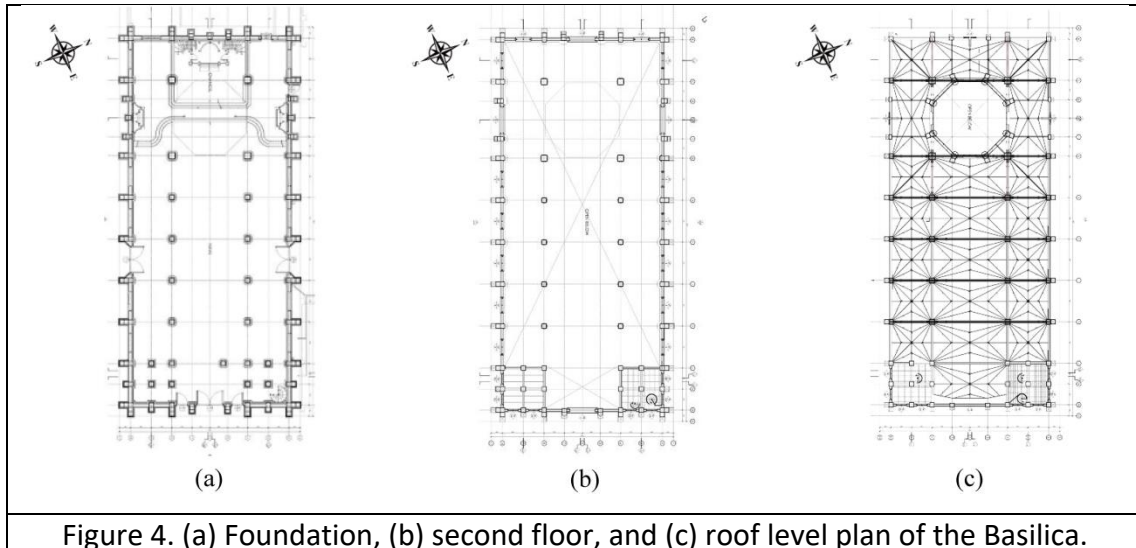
(a) Foundation, (b) second floor, and (c) roof level plan of the Basilica.
